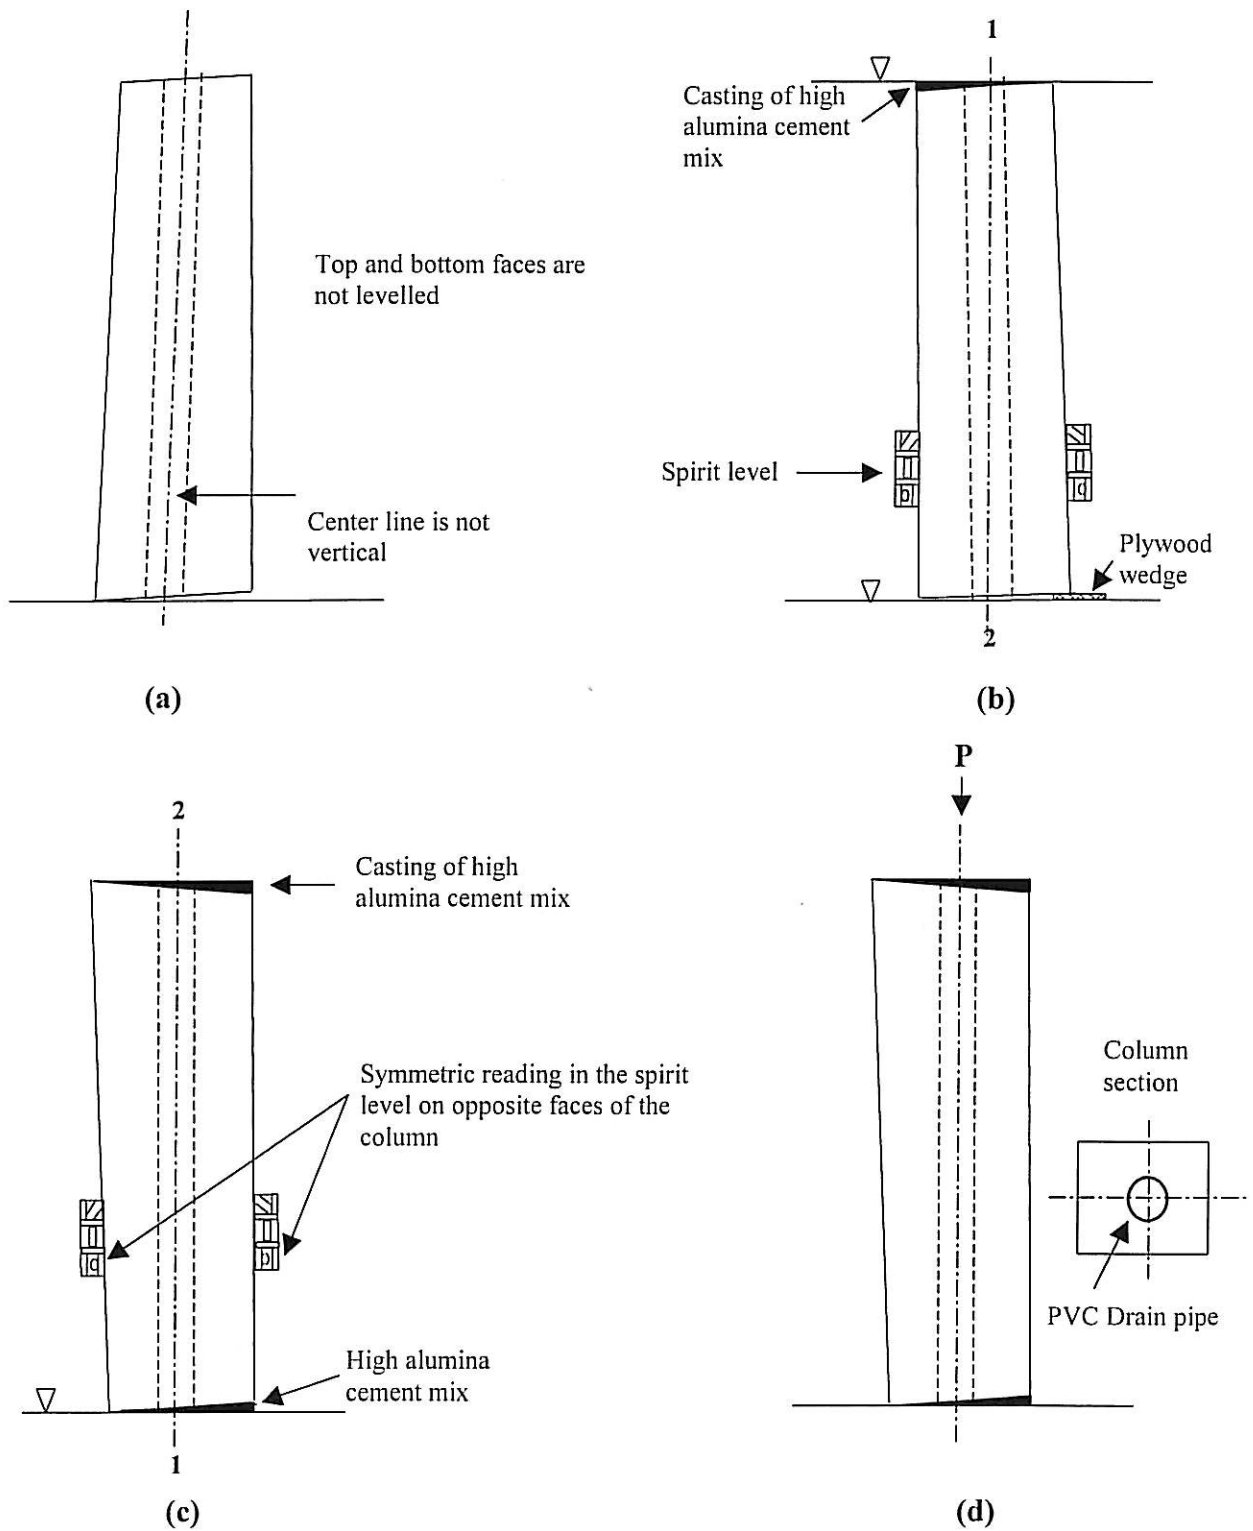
Steps in vertical alignments of the reinforced concrete columns
